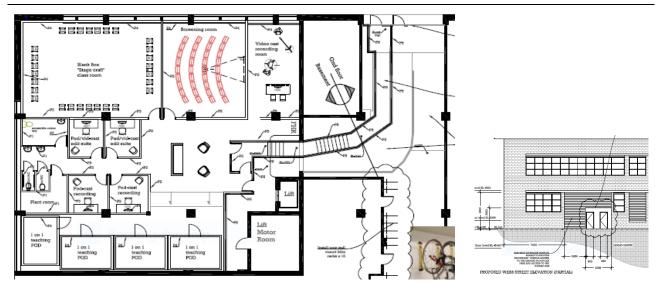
Original advertised basement and new door insert to existing Webb Street roller door
